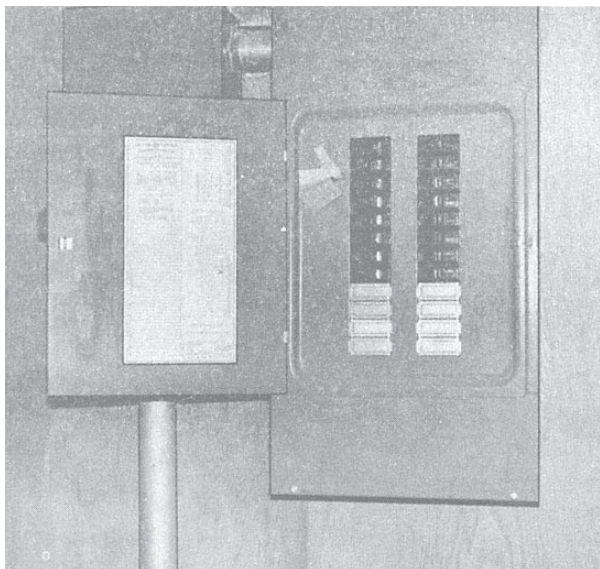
Typical layout for entrance switch, lighting panel, and power panel.
